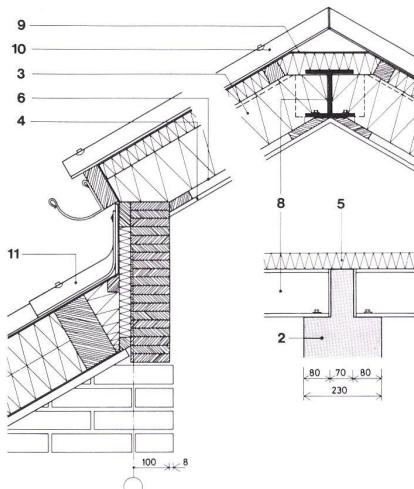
Vertical section of the roof construction, Type 1, 1:10. (2) Concrete element wall, 230 mm. (3) Beams, 150 × 63 mm, every 600 mm. 150 + 50 mm rockwool. (4) Gypsum board, 13 mm. (5) Fire bats. (6) Vapour barrier with glued connections. (8) Steel-section beams, HE 140 B. (9) Zinc sheathing. (10) Eternit corrugated board. (11) Eternit special purpose element, 30°.
